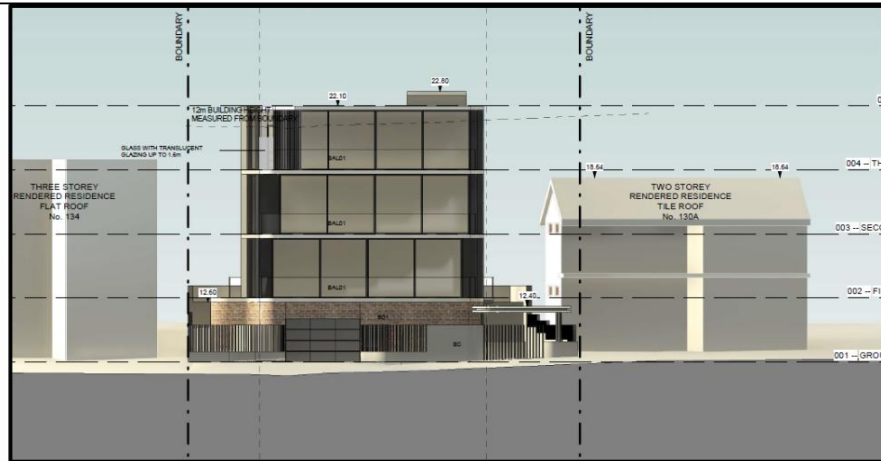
Excerpt of DA/465/2020 approved south elevation facing Marine Parade
